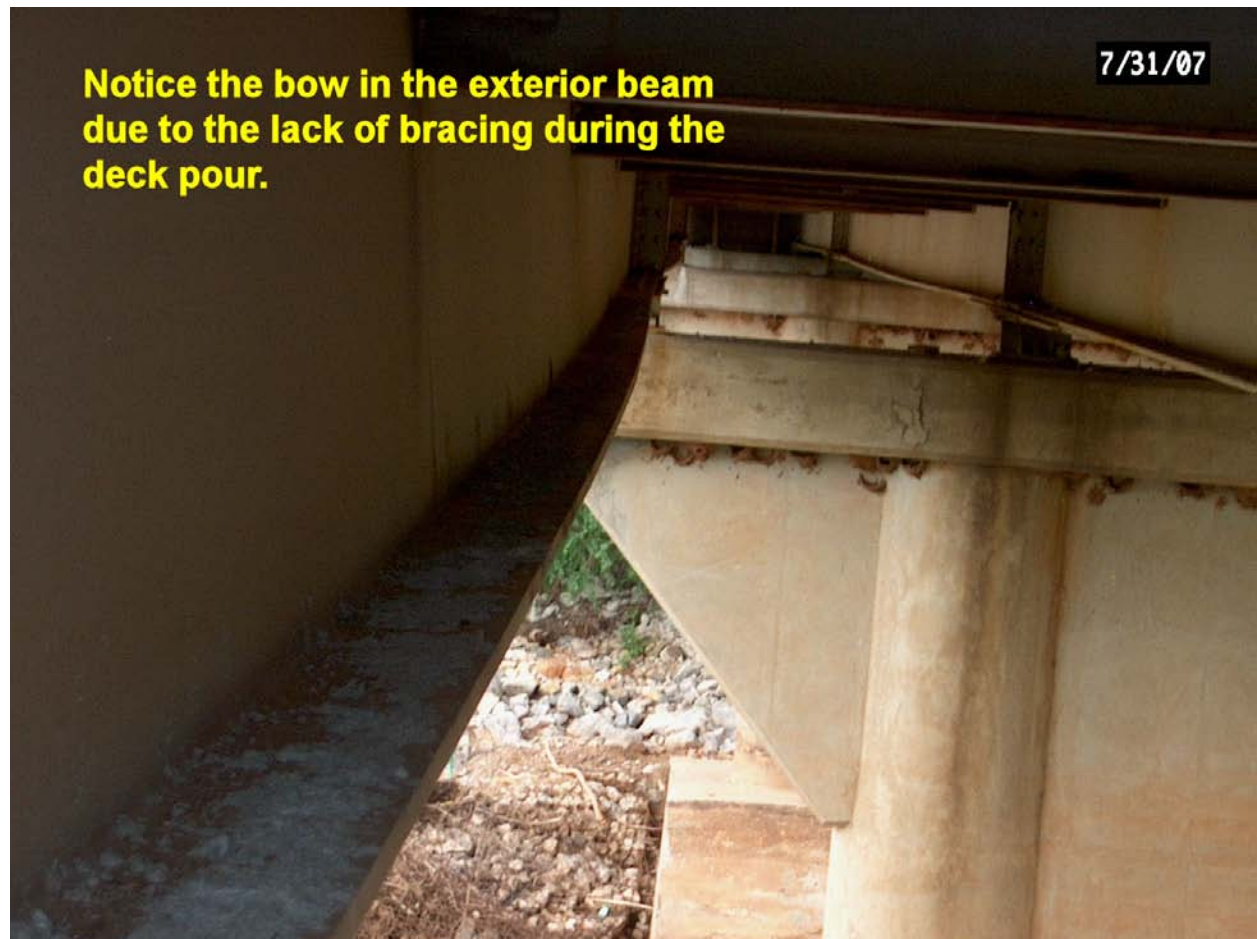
7. Photo. Bowing of Exterior Beam due to Inadequate Bracing
